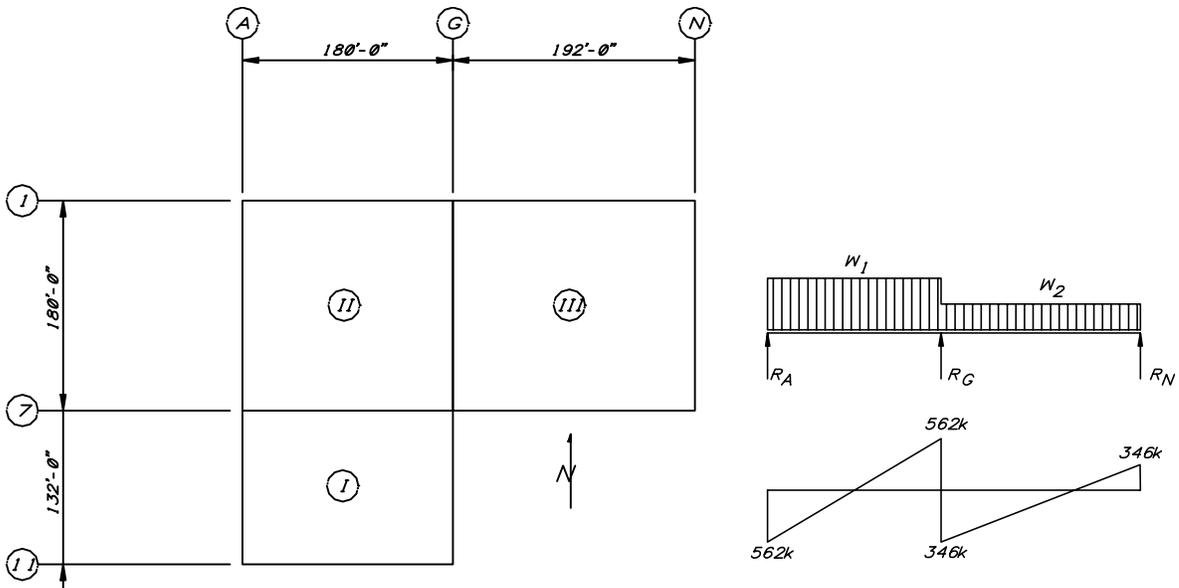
A-15. Roof diaphragm north-south seismic load and shear
